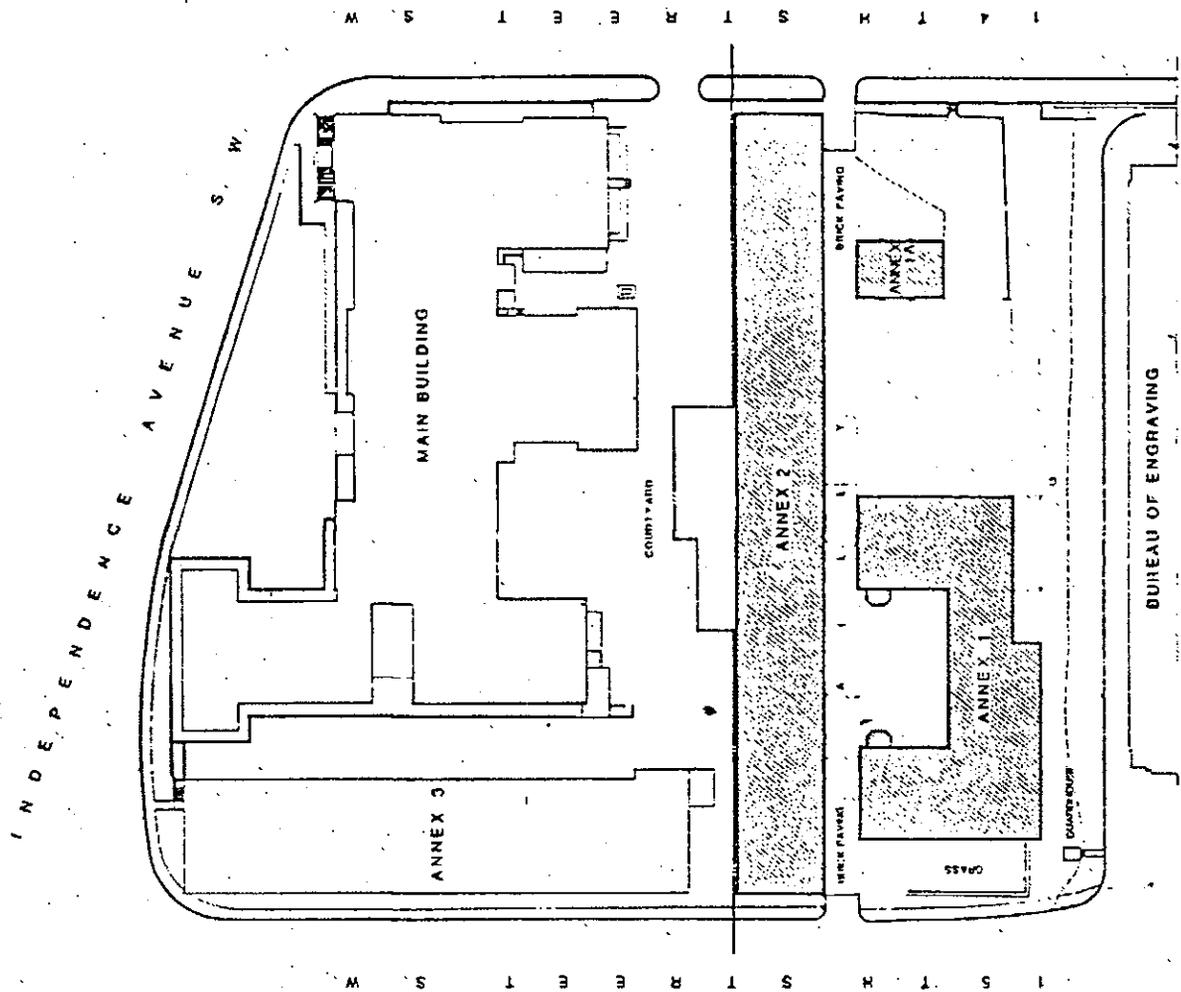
SITE PLAN RESTORED TO ORIGINAL PROFILE (i.e. without present-day in-fill)
